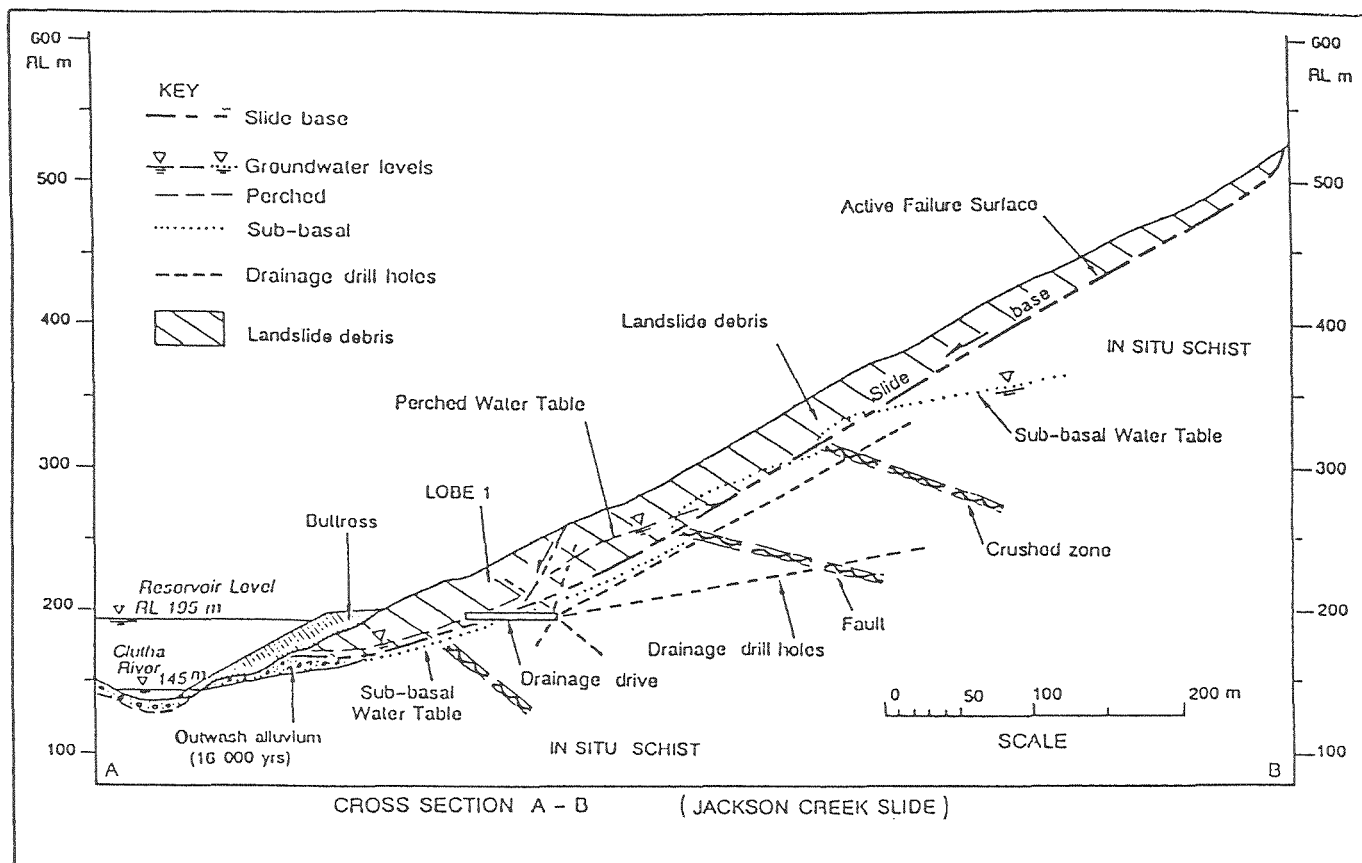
Stabilisation by gravity drainage and buttressing works at Jackson Creek Slide
